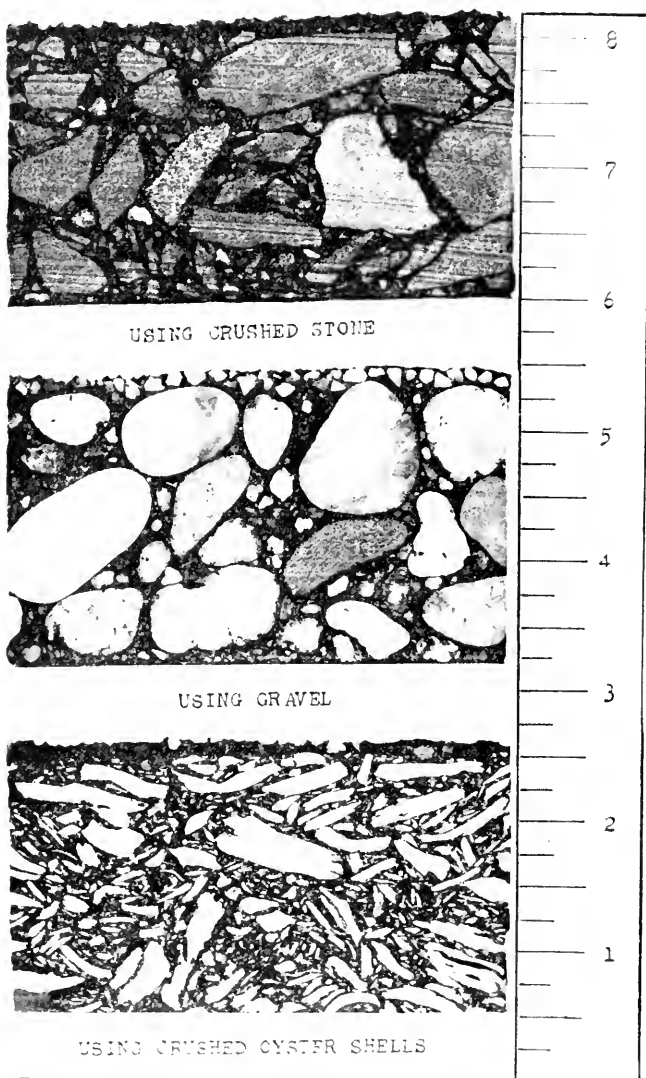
SECTIONS OF WARRENITE ROADWAY.
